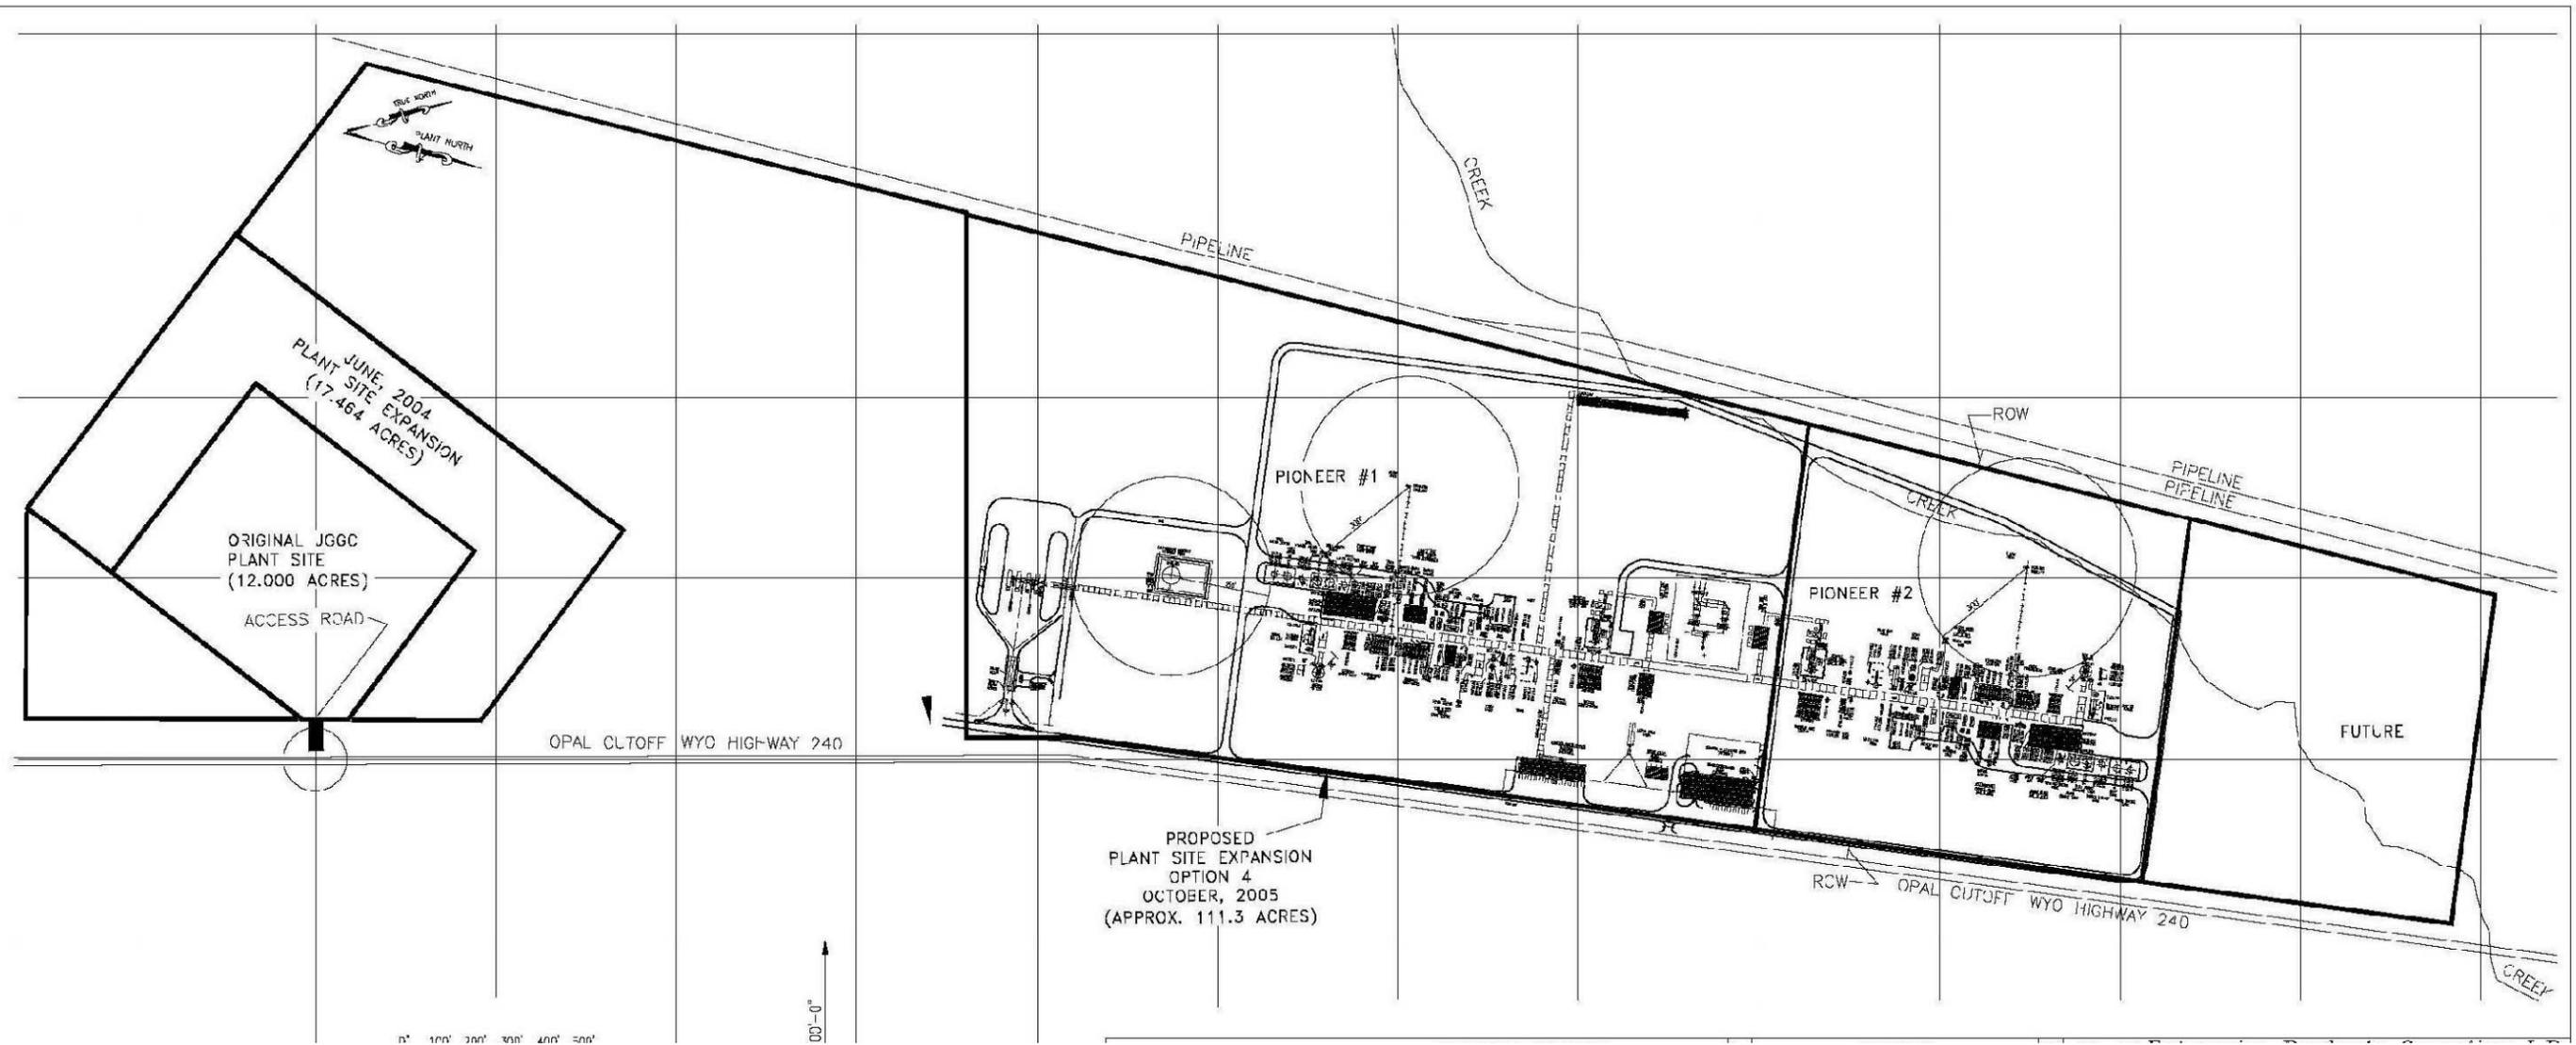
Proposed Pioneer Gas Plant Expansion Plan View.
